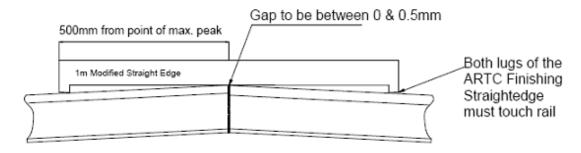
Weld misalignment tolerance in vertical plane (peaking). Maximum peak allowed in 1m is 0.5 mm.
